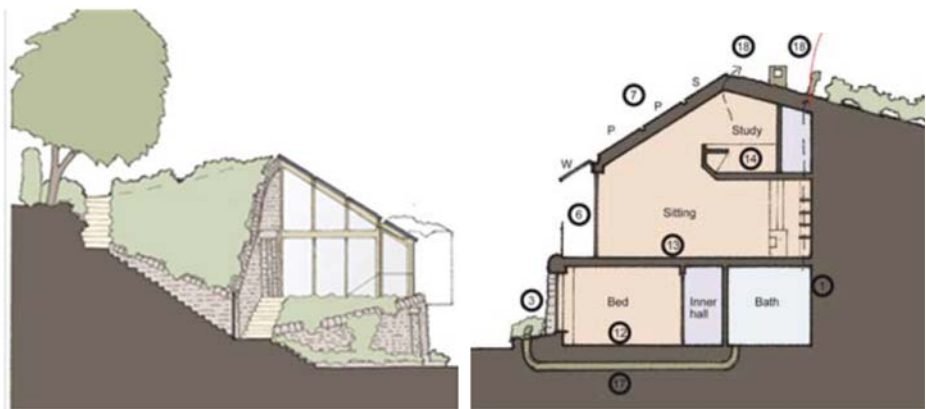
(a) West elevation; and (b) Cross section with southern roof orientation.
